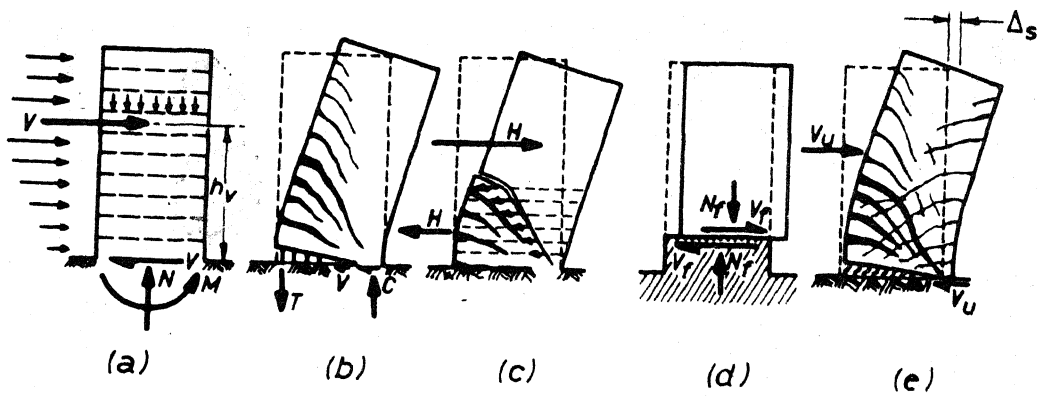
Failure Modes in a Laterally Loaded Reinforced Concrete Shear Wall.
